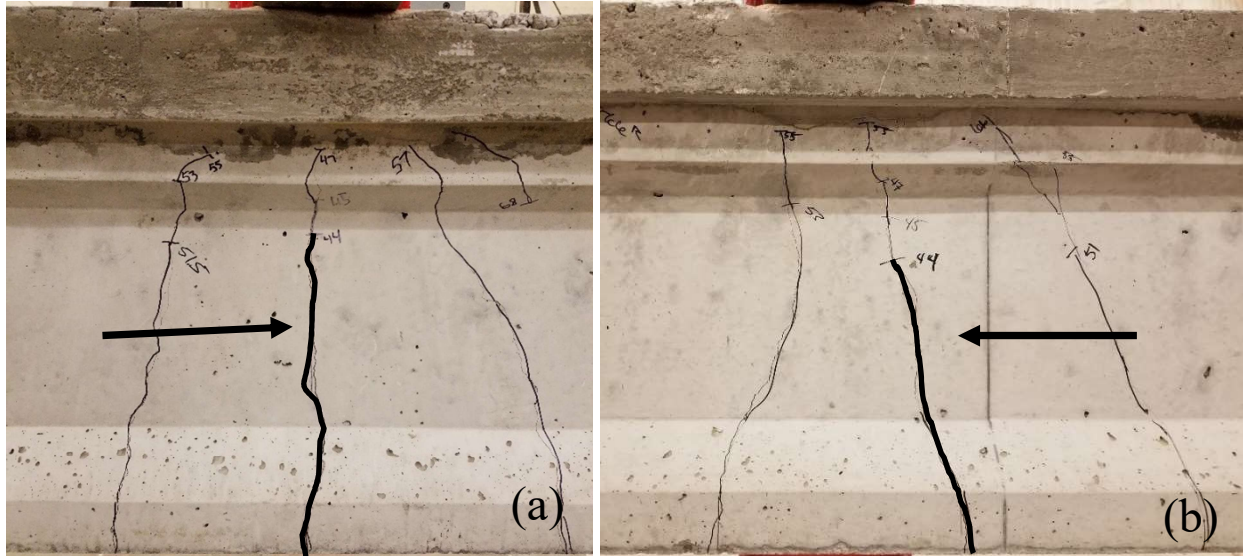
Initial flexural cracking under the load point on the RC2-N girder at 44 kips of load (a) and initial flexural cracking under the load point on the RC2-S girder at 44 kips of load (b). Arrows point to the dark lines that indicate the initial flexural cracks.
